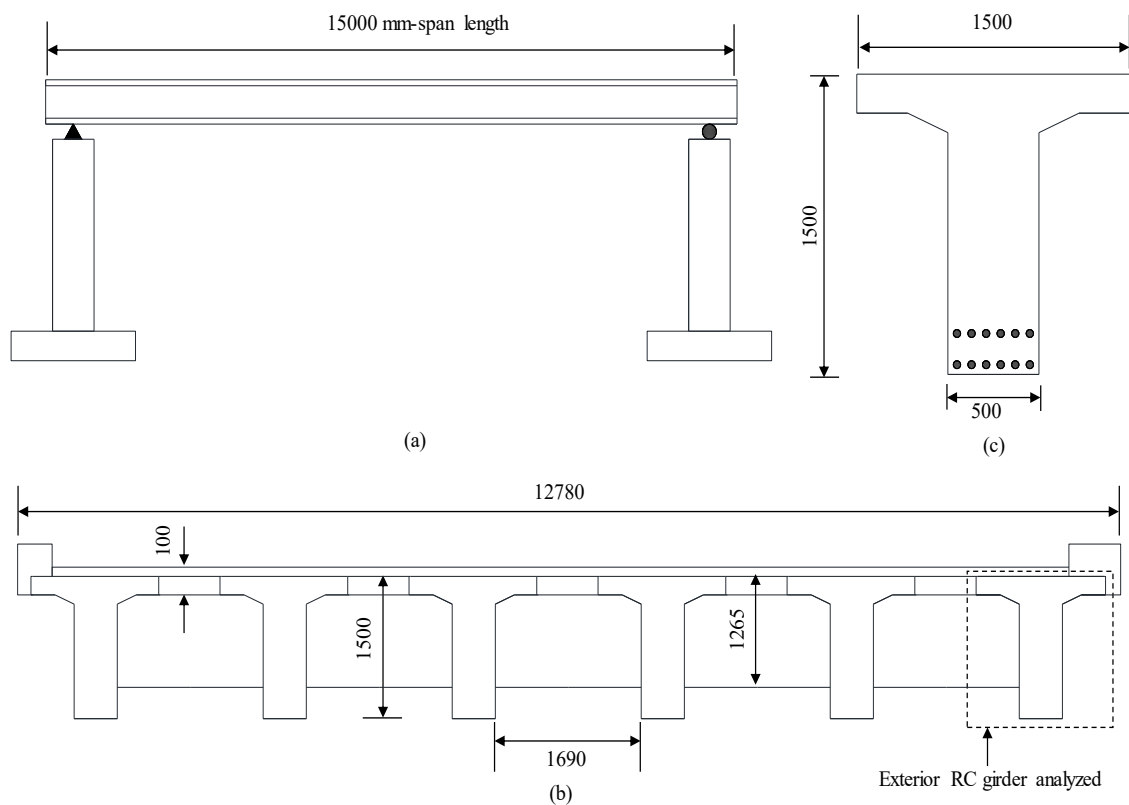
A details of RC bridge girder: (a) Elevation of RC bridge (b) girder system geometry, and (c) girder cross-section.
